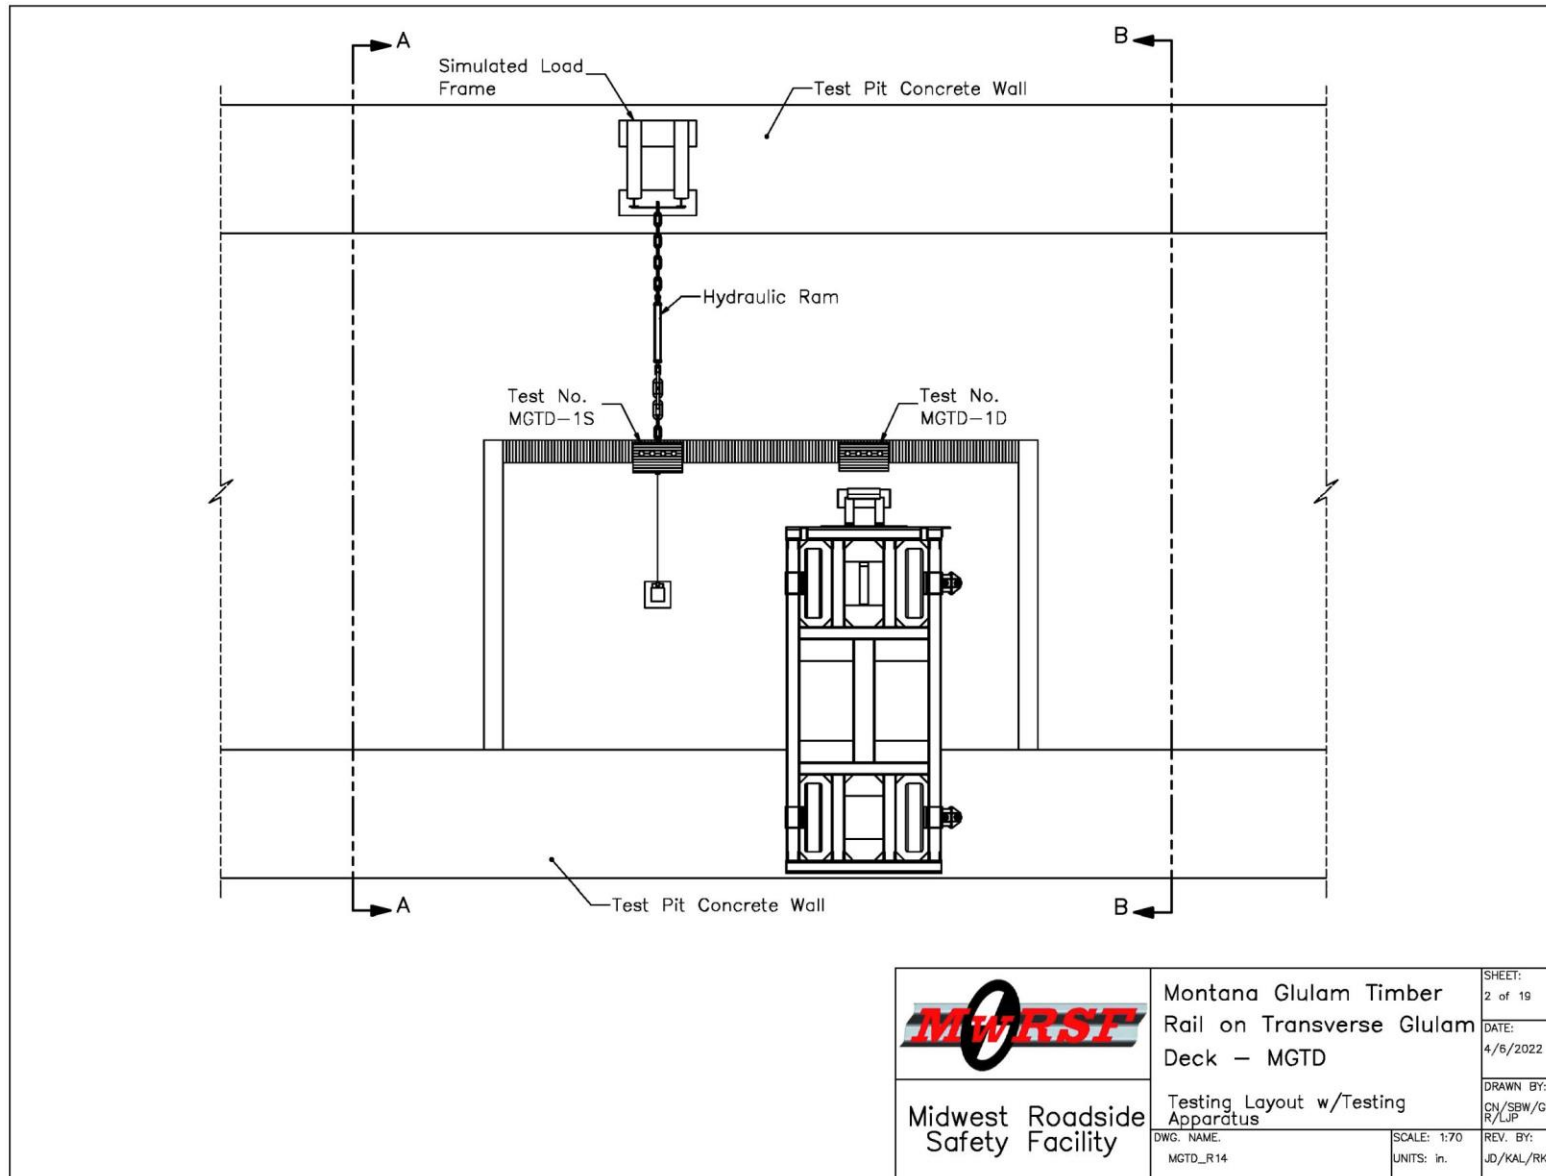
Test Plan and Layout, Test Nos. MGTD-1S and MGTD-1D
